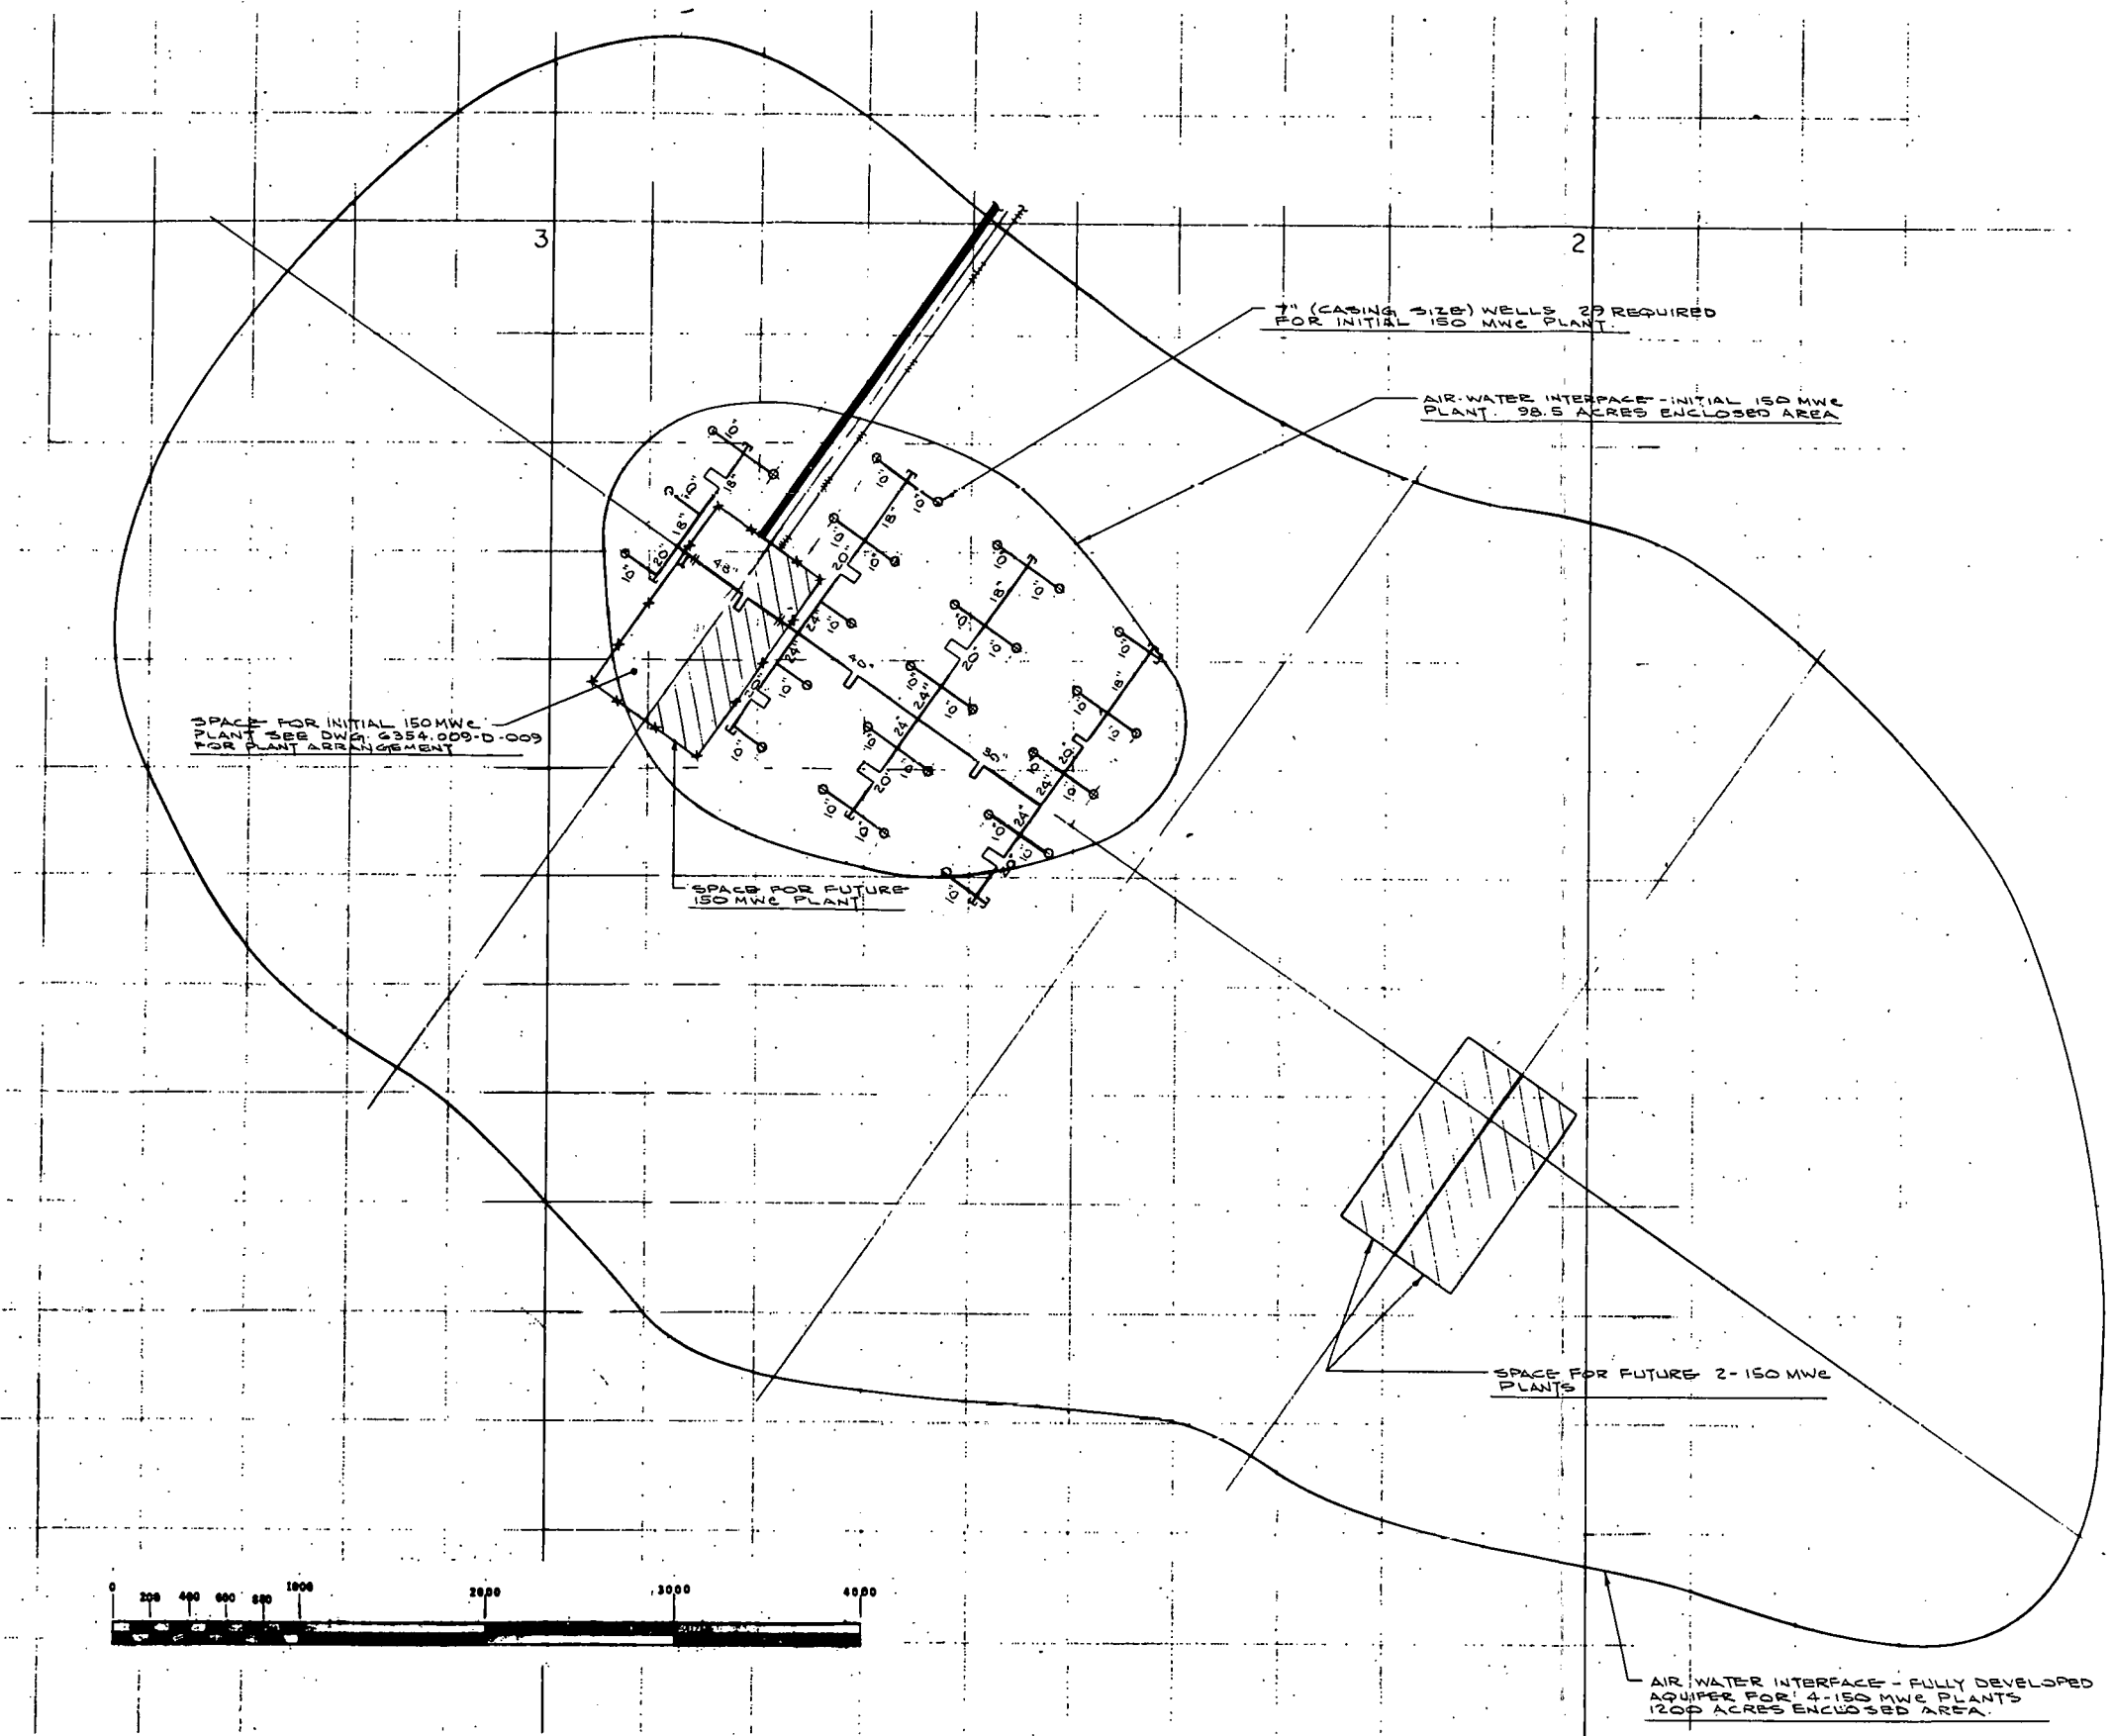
Layout of the Initial 150 MW Plant at the Brookville Site
